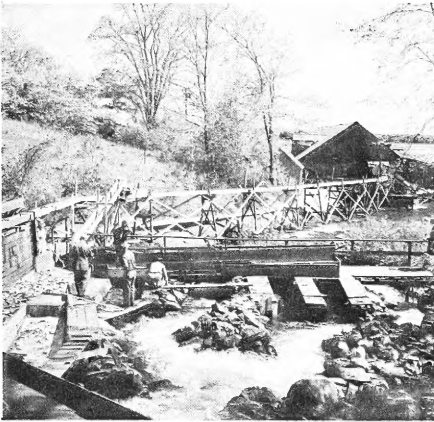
TRAP, SLUICWAY, AND PLANT.
